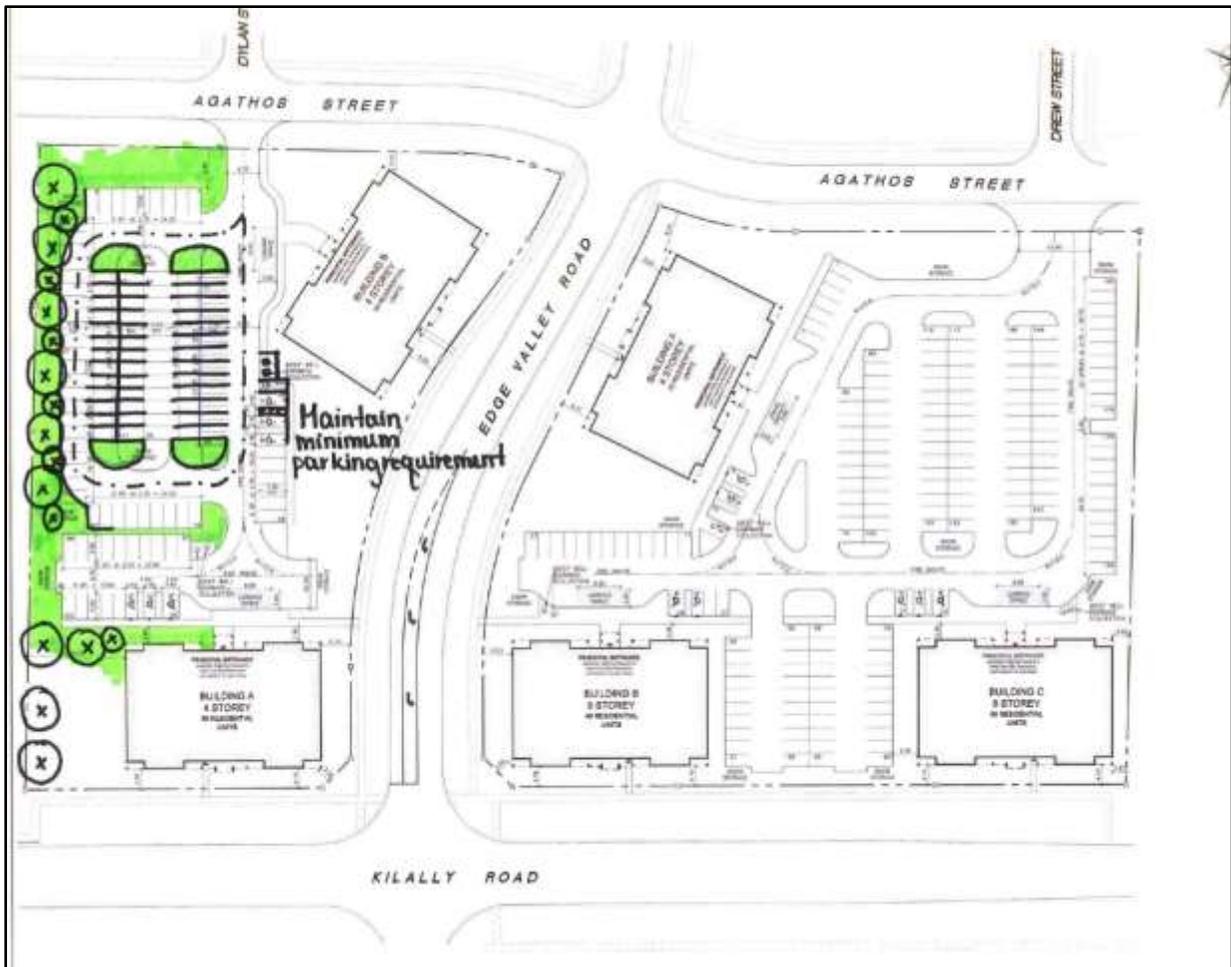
Sketch from Applicant on proposed site plan changes, with additional landscaping and drive aisle, at 480 Edgevalley Road
